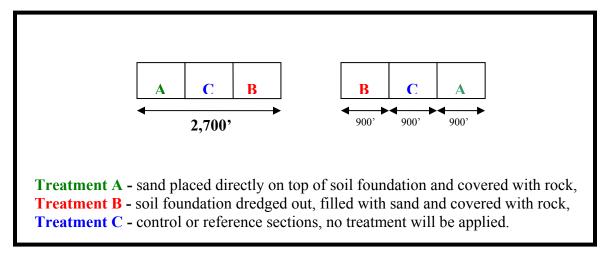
Shoreline protection foundation improvement demonstration (LA-06) layout and treatment regime.
